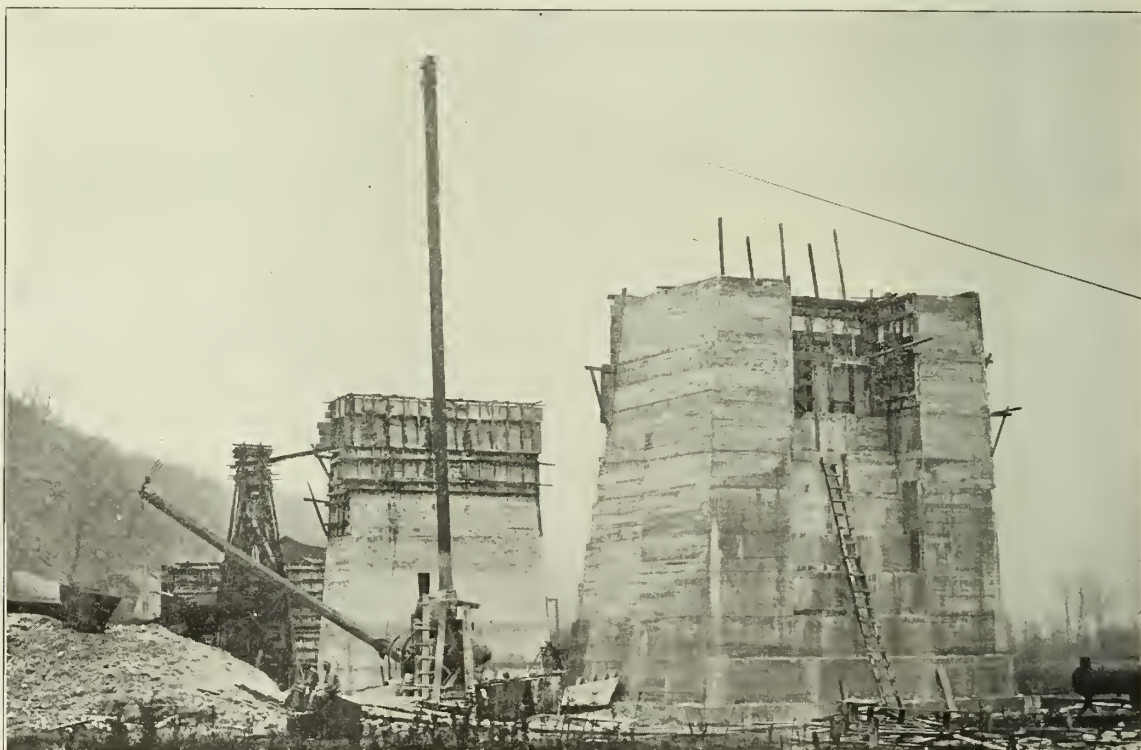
East Abutment of Bridge at Station 820, East of Connellsville 1¼ Miles.
